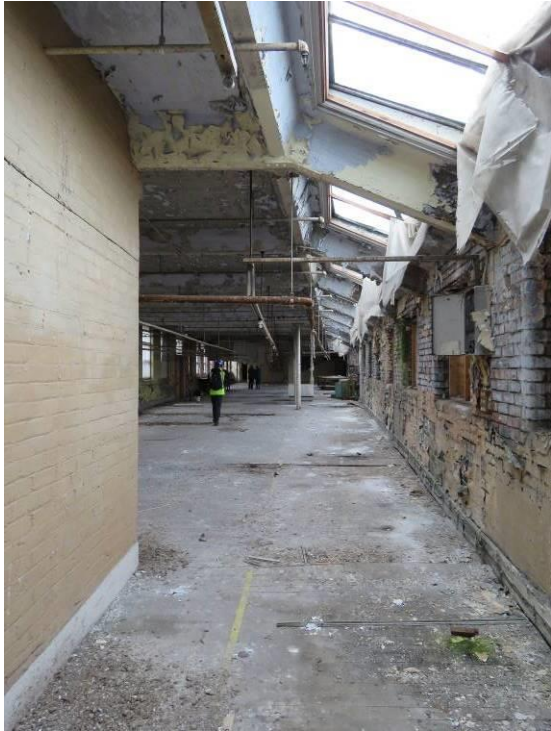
A view looking west across the 1920s third floor level, showing a clearer view of the roof lights.
